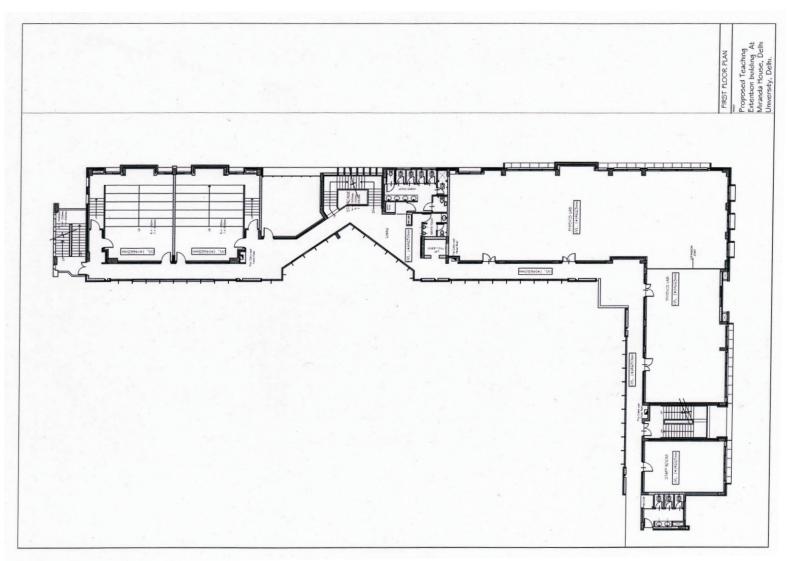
(p): Layout plan of New Academic Block: First Floor
